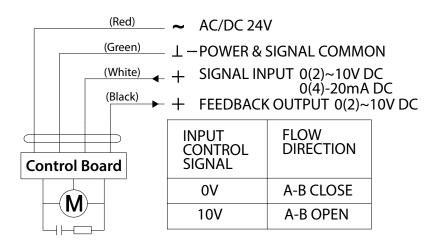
Modulating Fail-in-Place and Electronic Fail-safe Wiring
